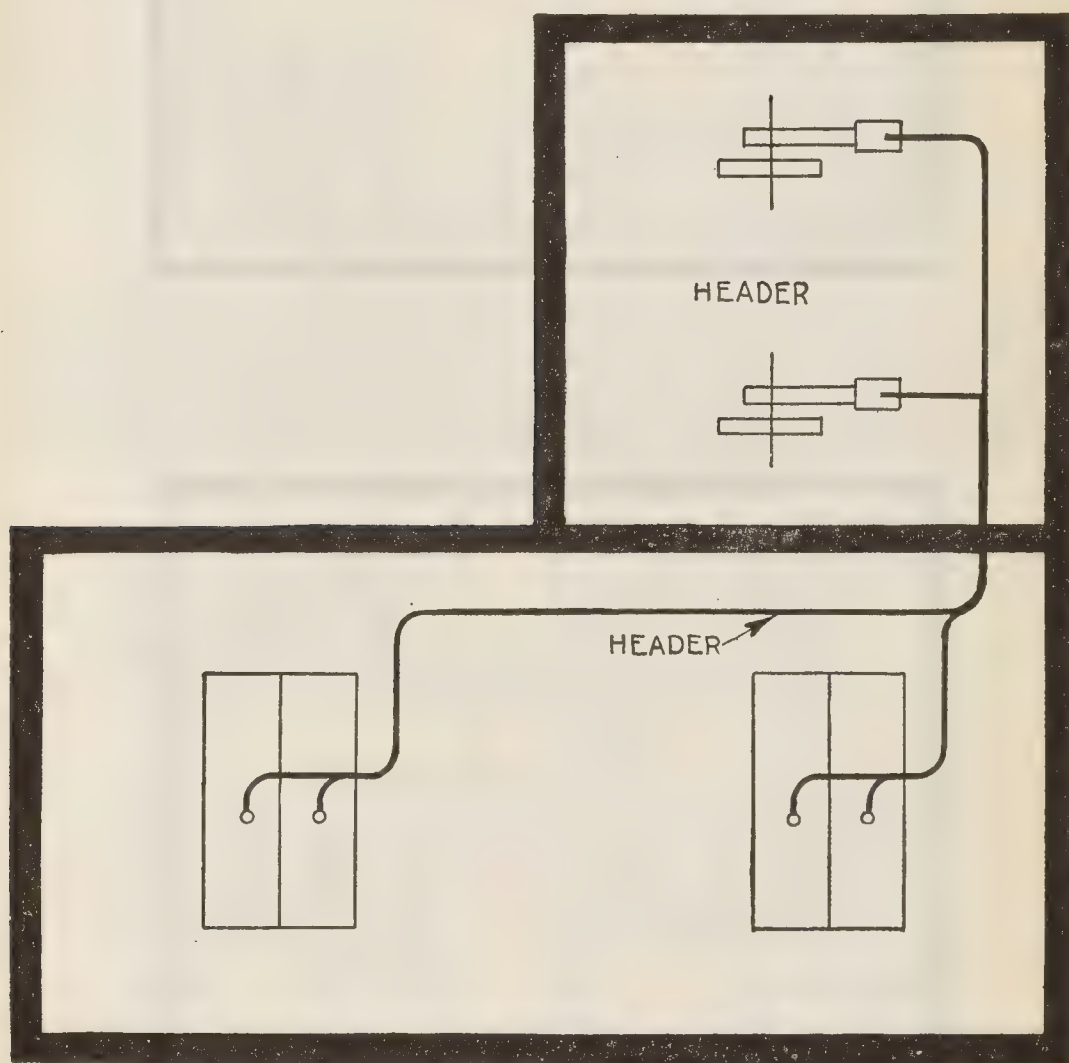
,362.—*Auxiliary header* system of piping. Where boilers and engine are located as above a larger header is required than in fig. 8,361. The section farthest from the engine may be made just large enough to serve the branch connection to end boilers, and its size progressively enlarged at each branch connection. The reverse treatment may be applied to the header serving the engines, thus reducing radiation surface and cost.
